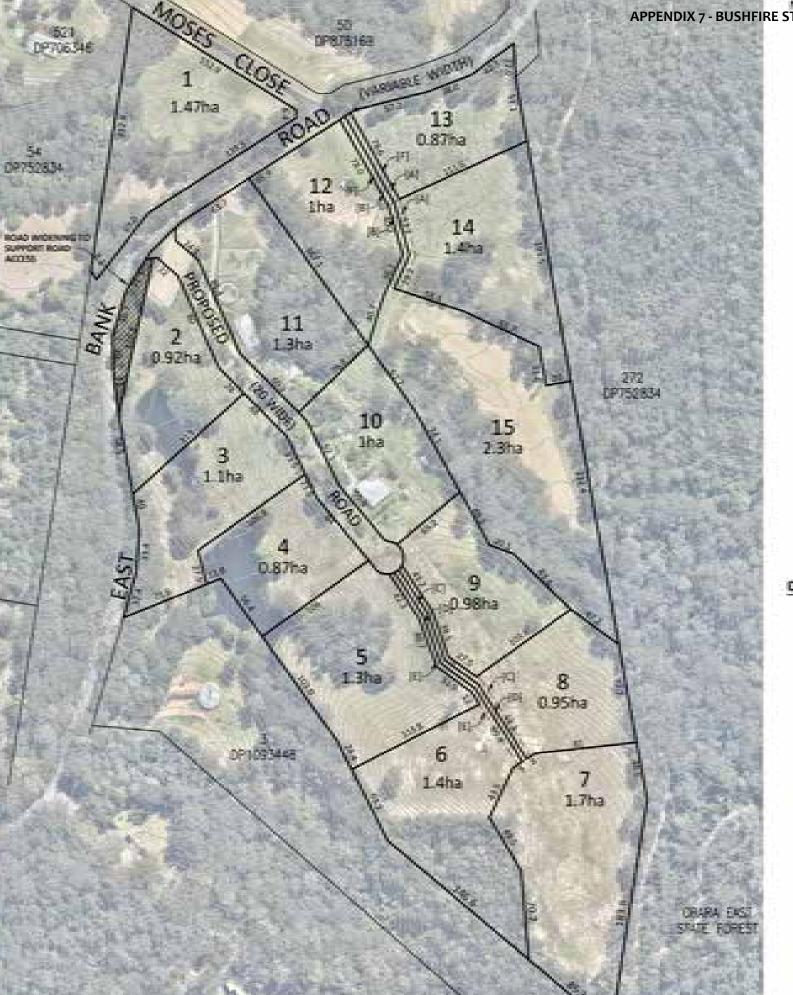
proposed concept plan for subdivision (Land Metrics, 28/02/2022)
